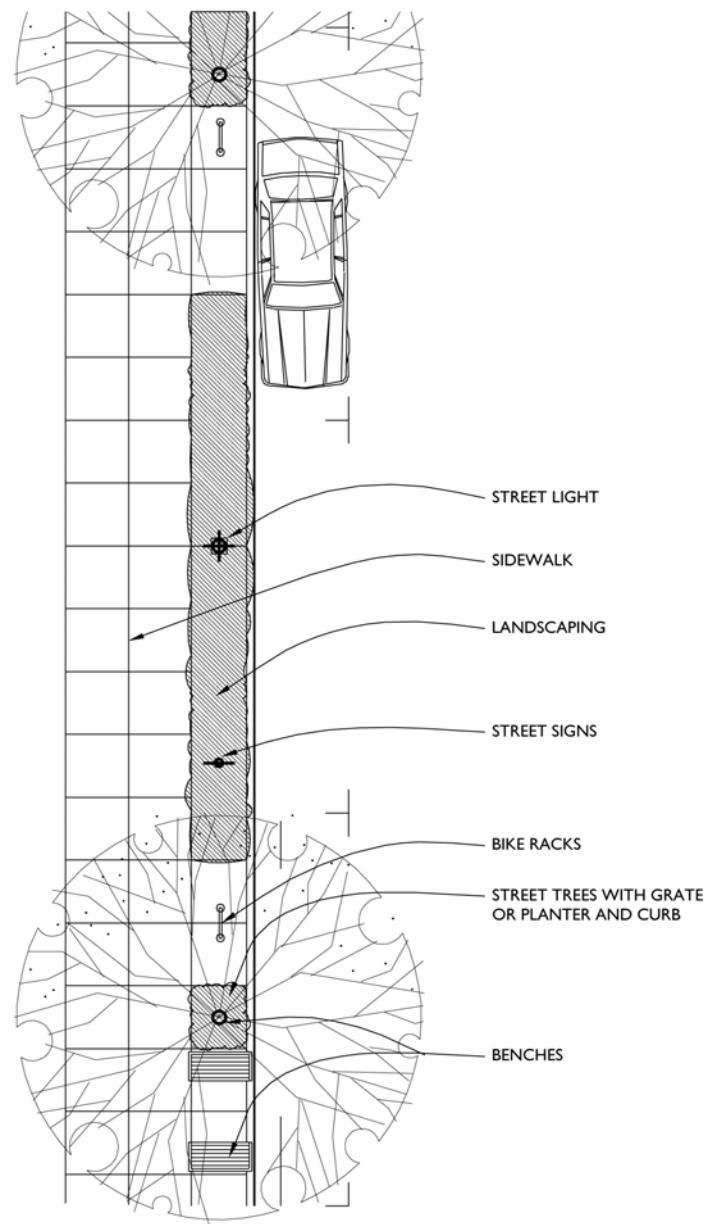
PLANTING POCKETS ALONG ROADWAYS
